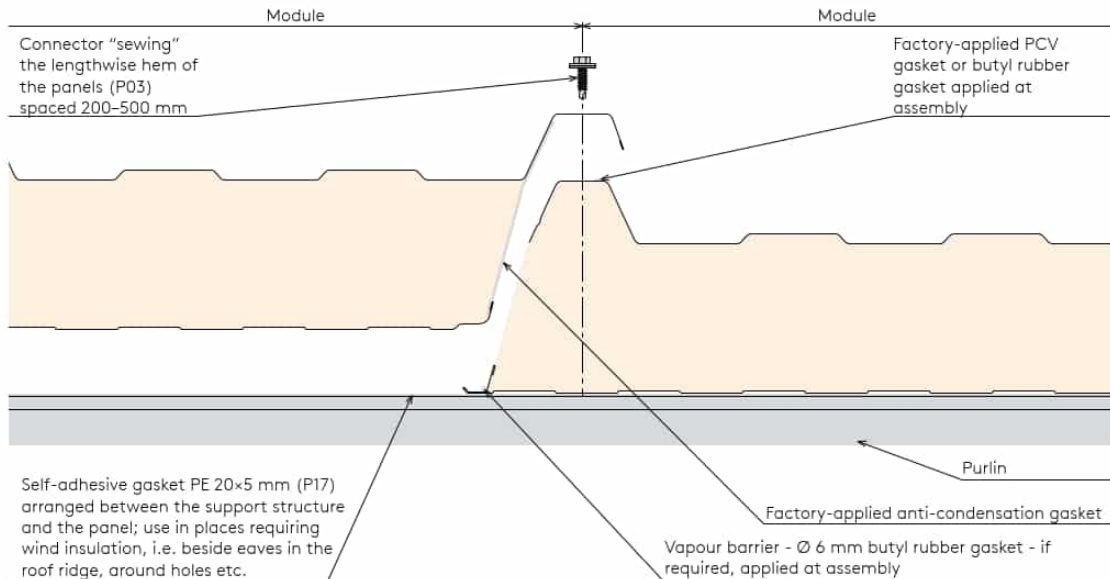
Arrangement of connectors in the KS1000 RW panel (normal zone)
